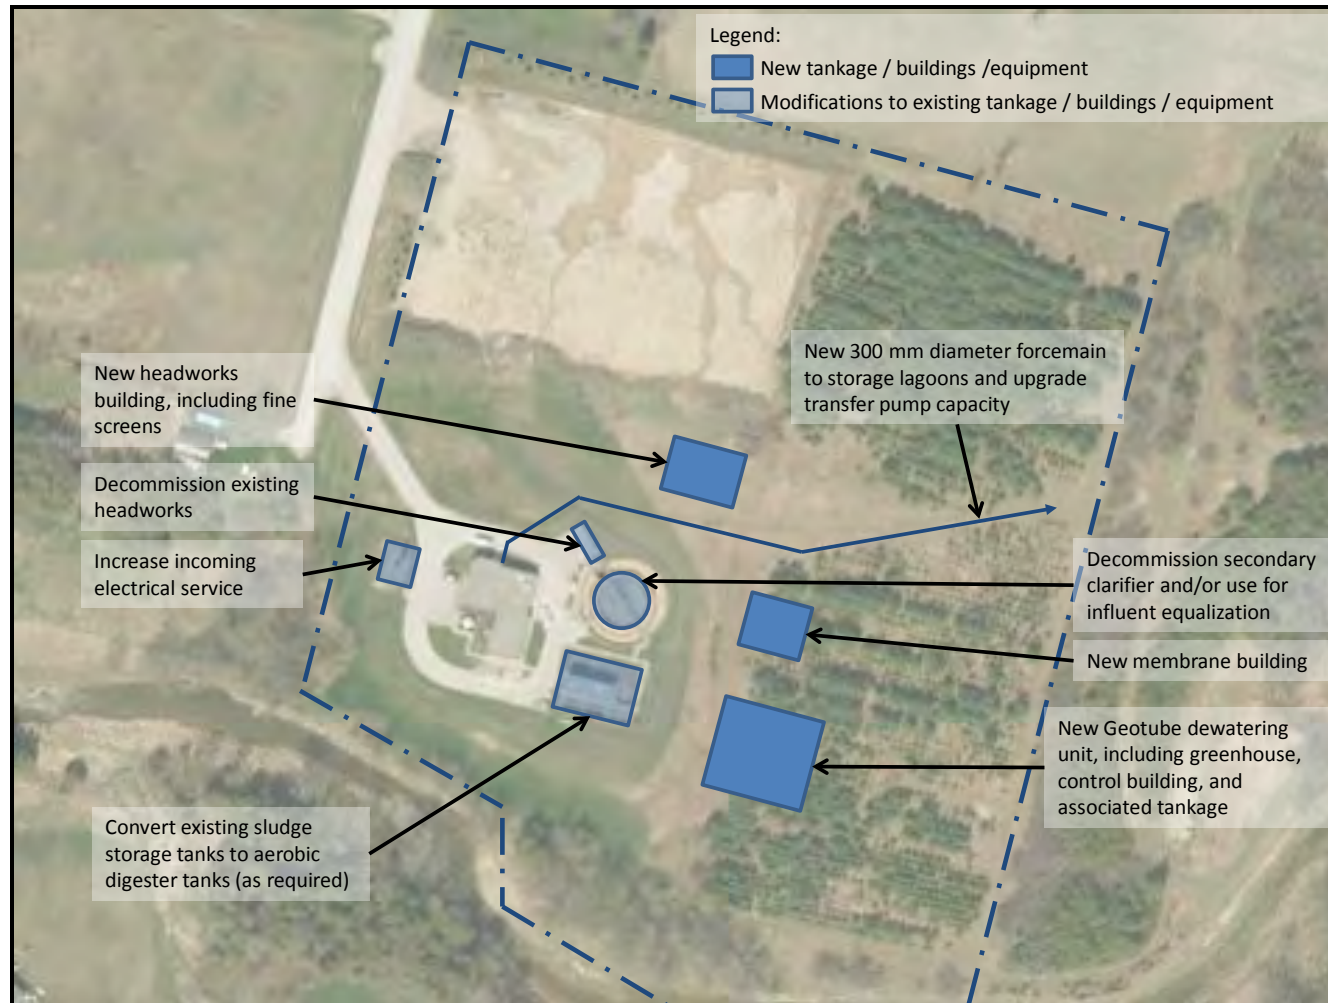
Option 4B - Retrofit Existing EA to MBR with new Geotextile Dewatering and Cake Storage
